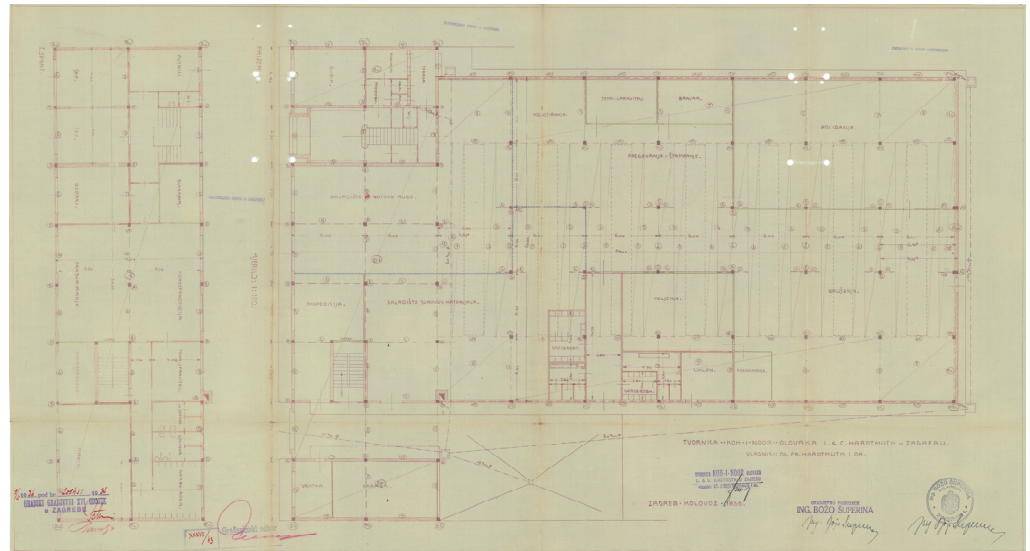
The pencil factory 'Koh-i-noor L. & C. Hardtmuth' in Baruna Filipovića Street, Zagreb, August 1936, ground floor and 1st floor plan 1:100. Source: State Archives in Zagreb (HR-DAZG-1122 ZGD TOZ-3245).
